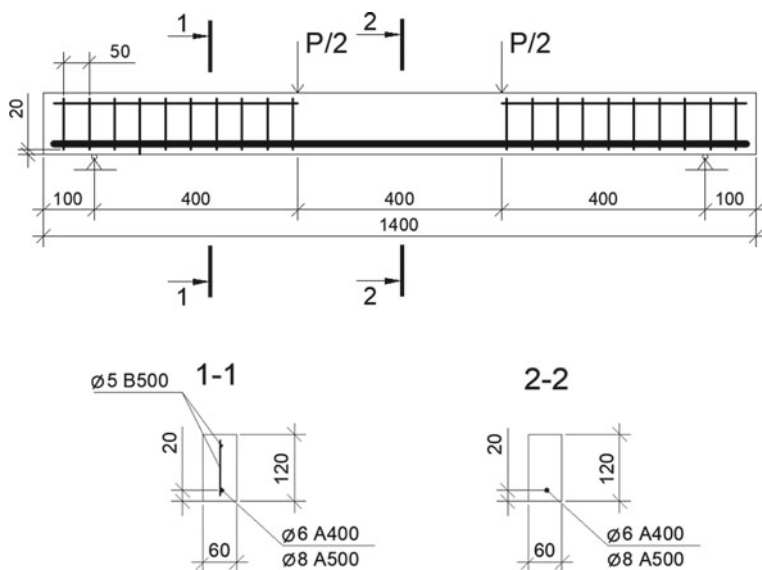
Geometric characteristics and reinforcement of cellular concrete beams
